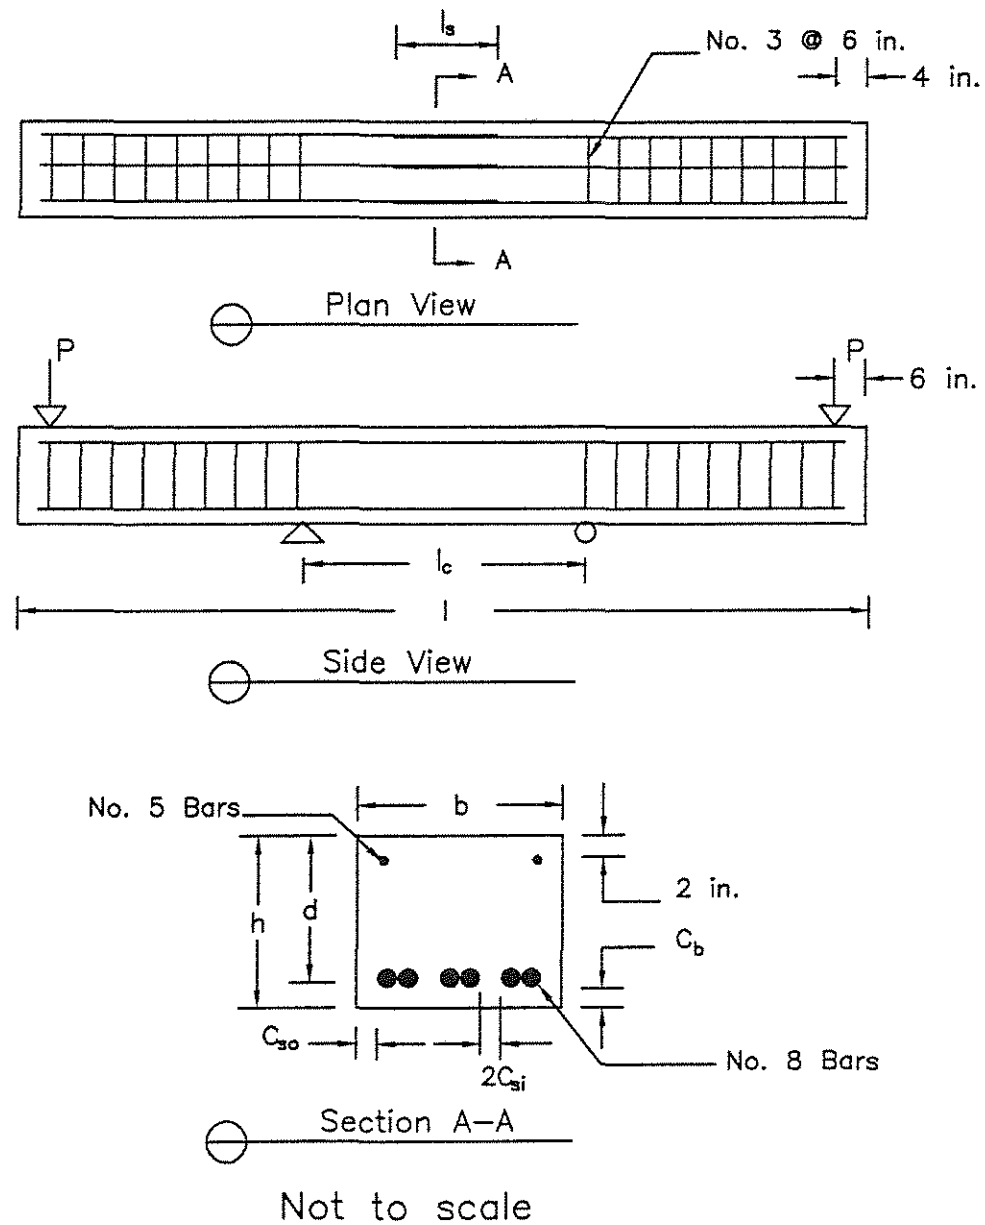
Typical beam splice test specimen with 3 splices and no stirrups
